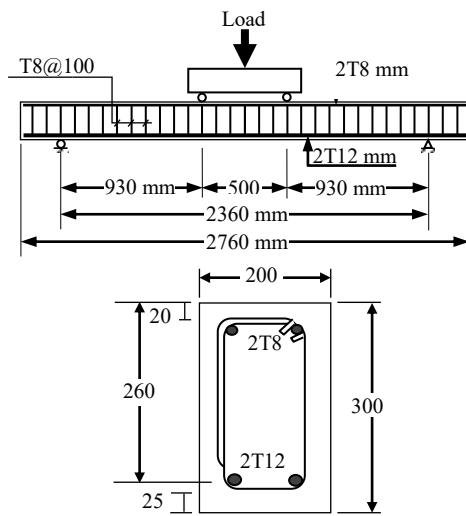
Elevation and cross section of the beams (All dimensions are in mm).
